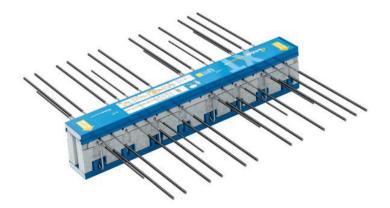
Load-bearing insulation element for projecting balconies (source: Schöck Bauteile GmbH)
